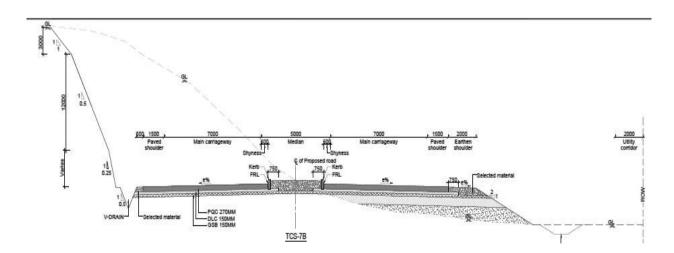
TCS-7B Typical Cross Section of 4-Lane Carriageway (One Side Cutting)
